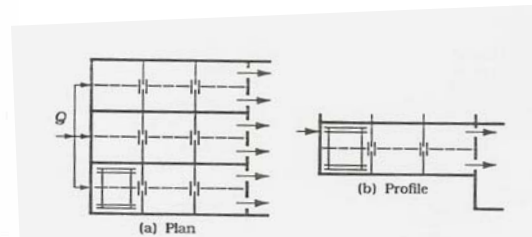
Horizontal-Shaft Paddle-Wheel Flocculator (Axial-Flow Pattern)
